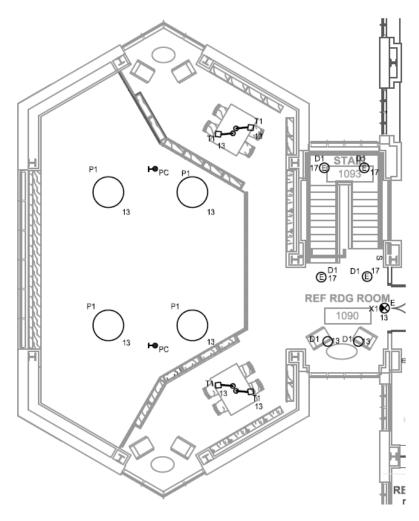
| Reference Reading Room - First Floor Lighting Plan
